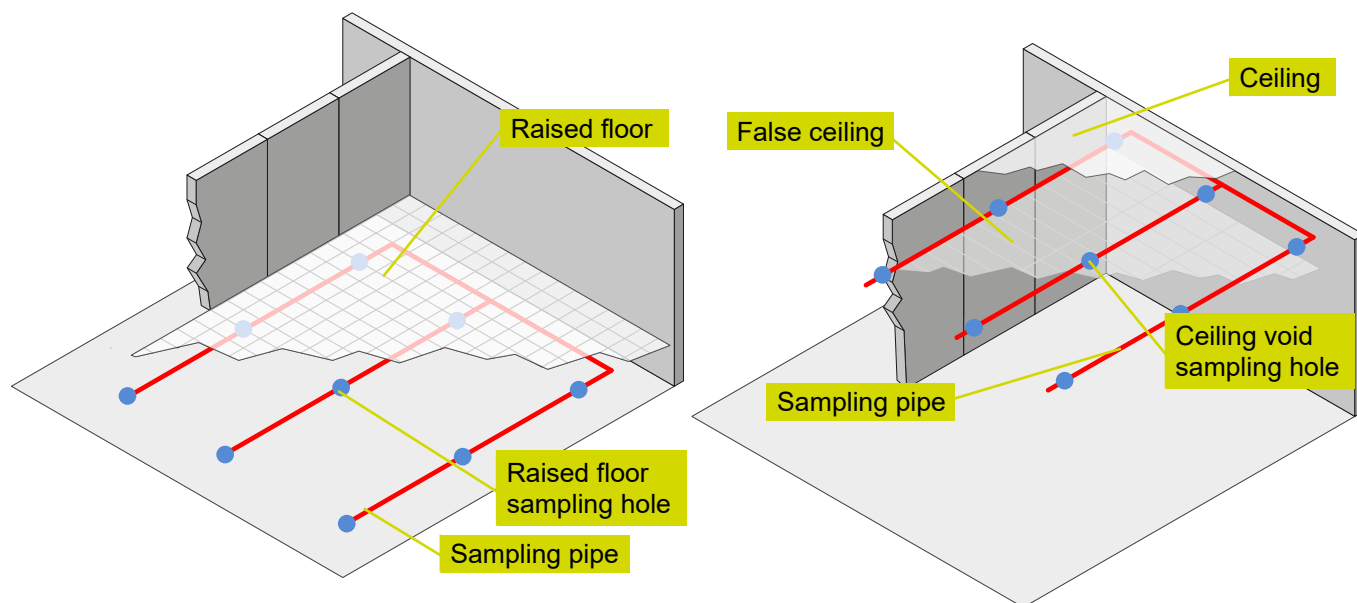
Fire detection placement (raised floor or ceiling plenum)
